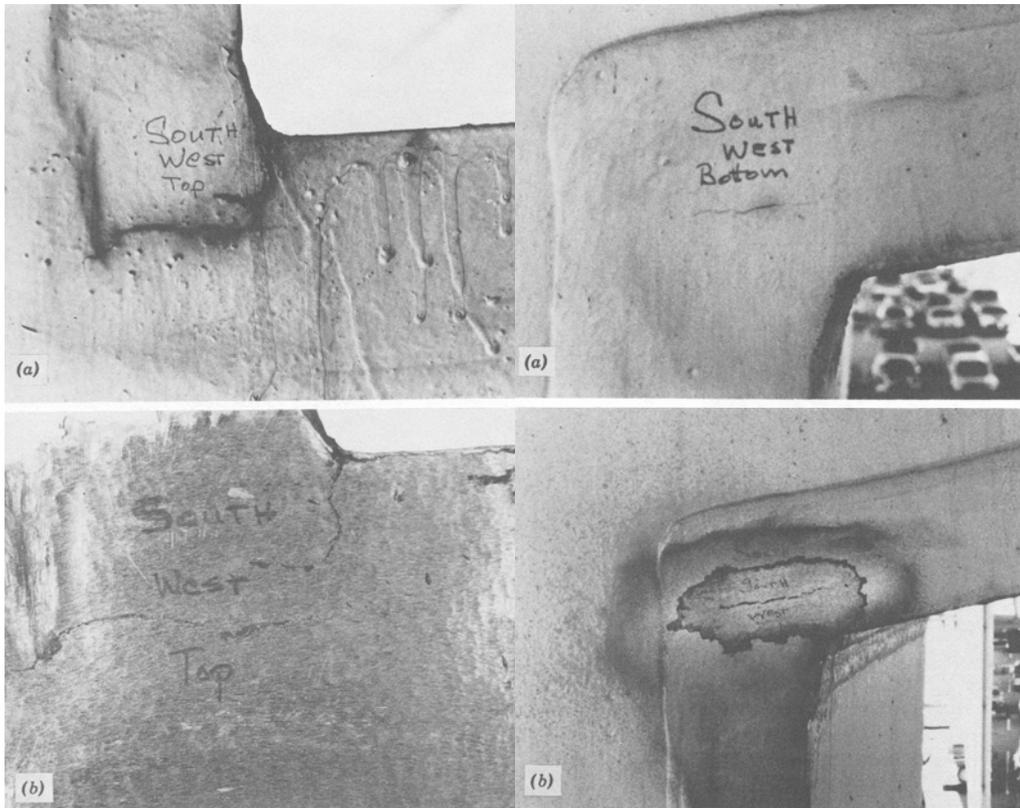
Lamellar cracks in girder tension flanges (left) and compression flanges (right) (Fisher 1984)
